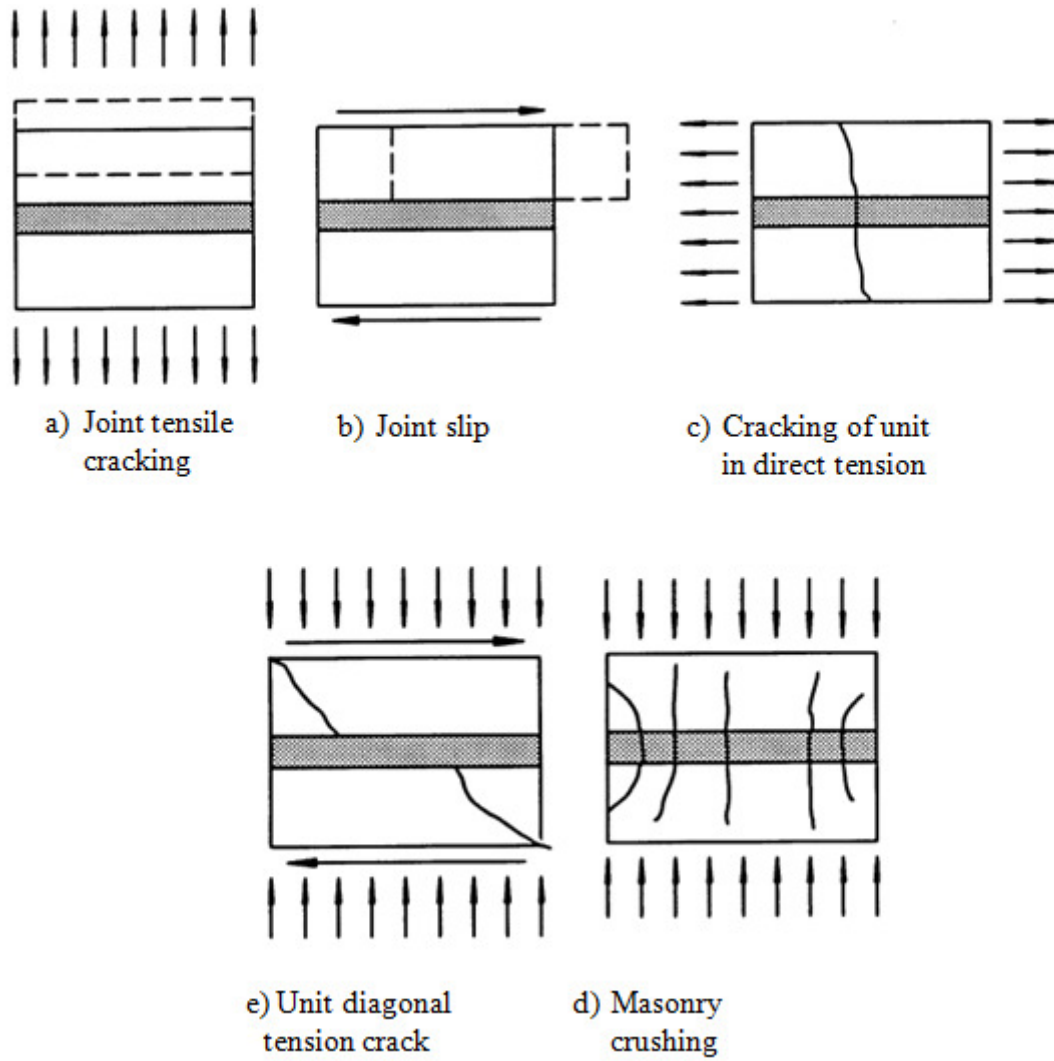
Masonry failure modes (Lourenço and Rots, 1997)
